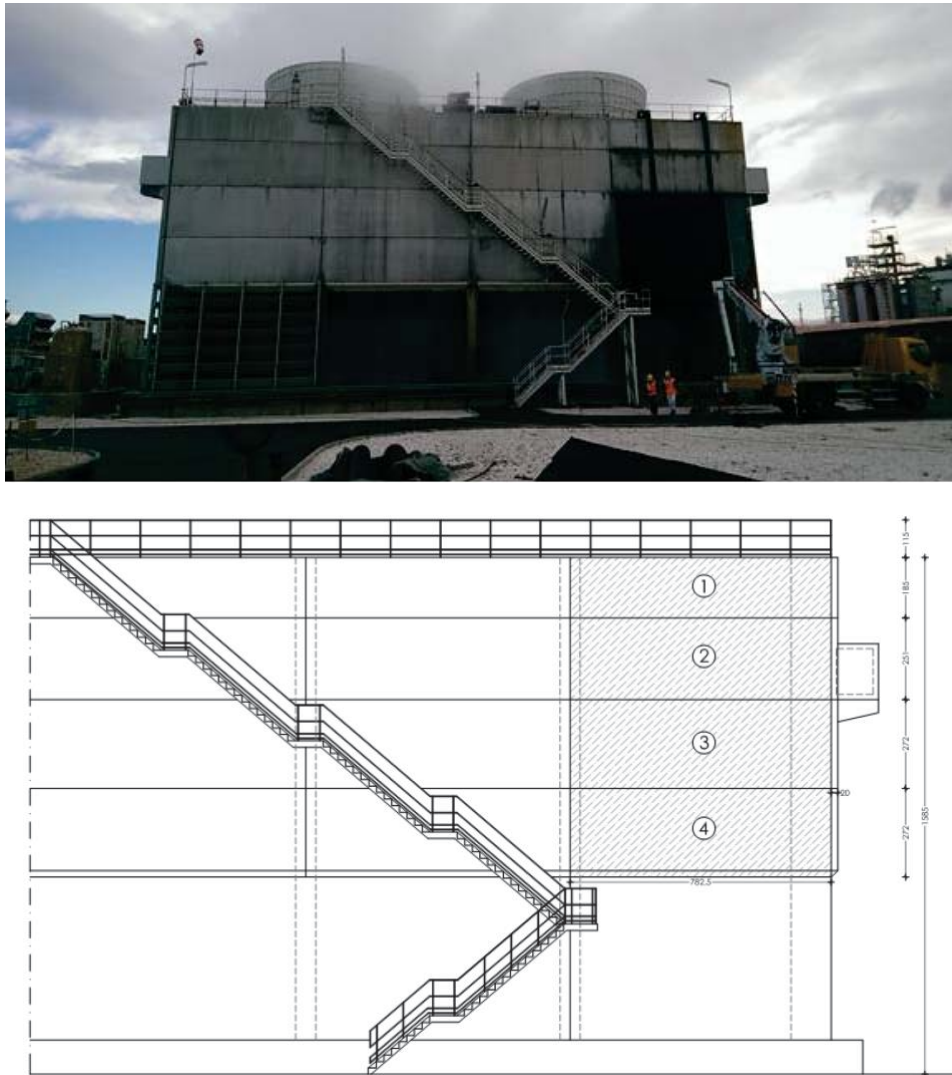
Cooling tower view with collapsed panels (top), drawing with highlighted collapsed panels (bottom).
